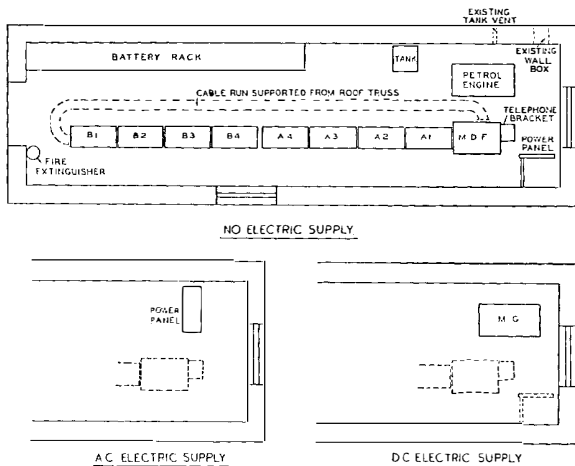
LAY-OUT USING EXTENDED A TYPE BUILDING.
